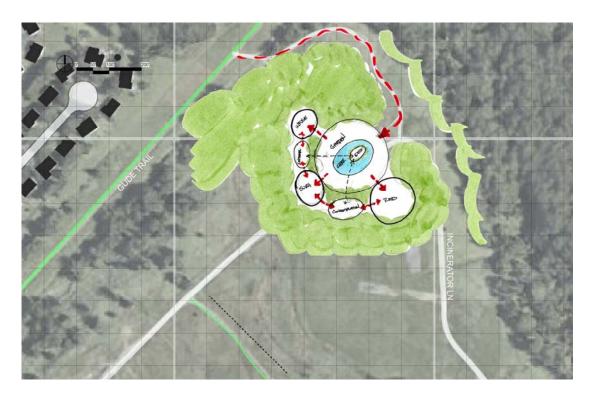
Scheme 1 Center lake between two buildings (Source: Author)
